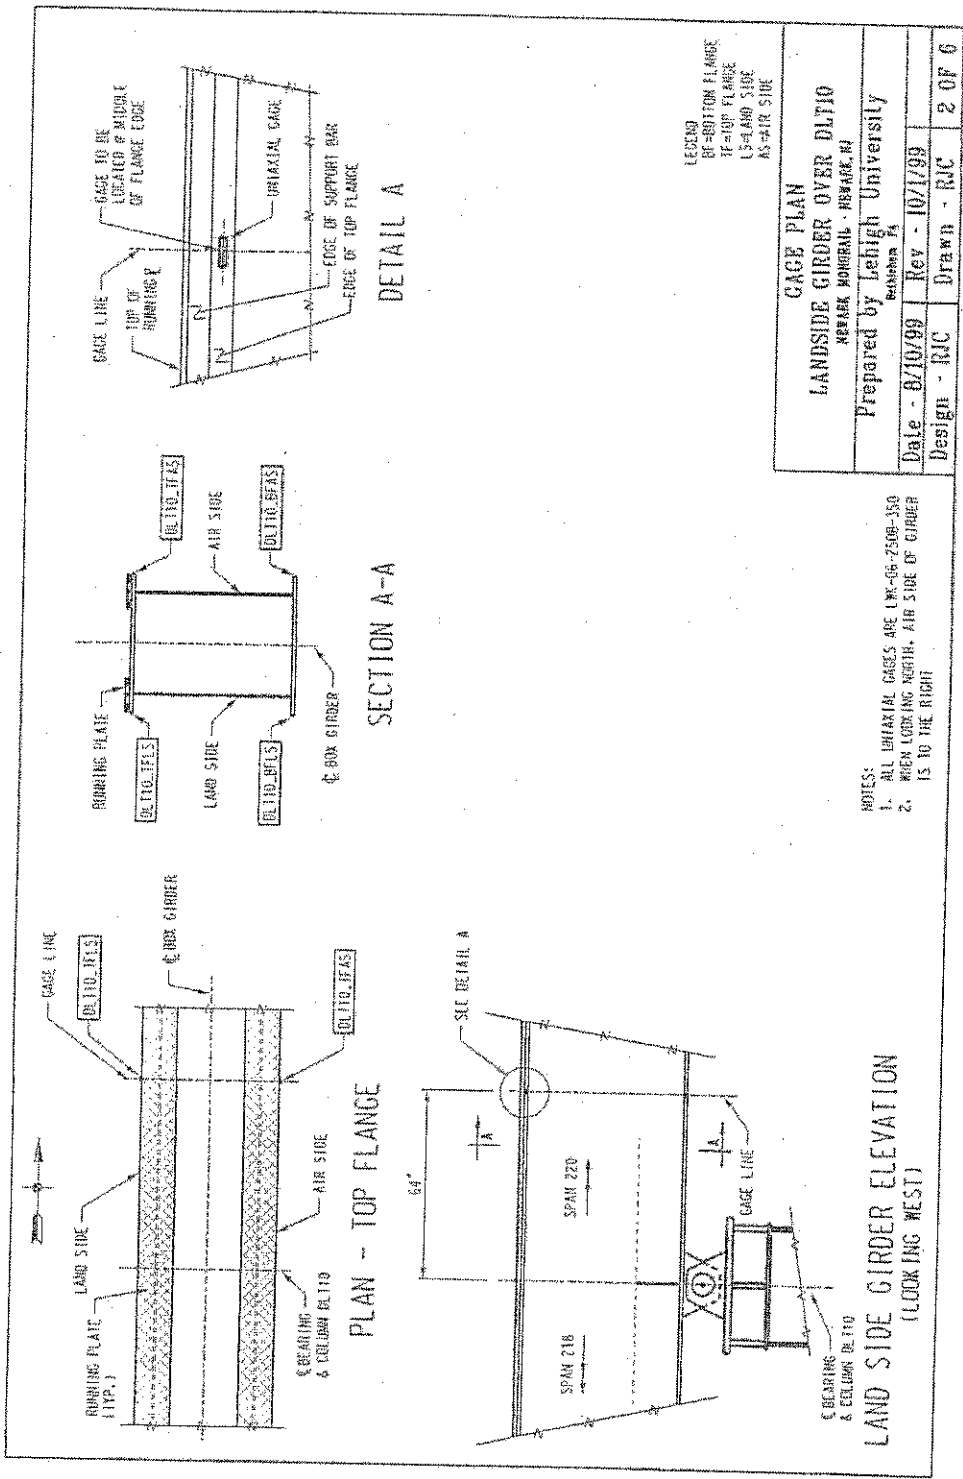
Strain Gage Layout Adjacent to Column DLT-10 – Land Side
